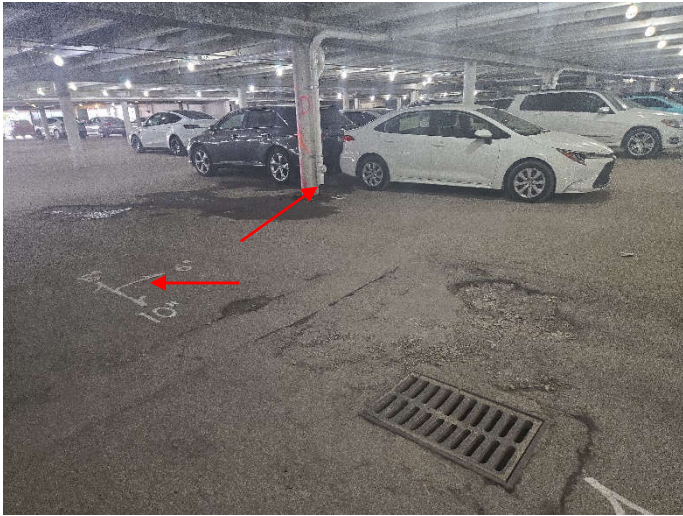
Plaza del Prado, Garage Deck Storm Drainage, Downspout D10 and existing Catch Basin. Proposed underground layout
